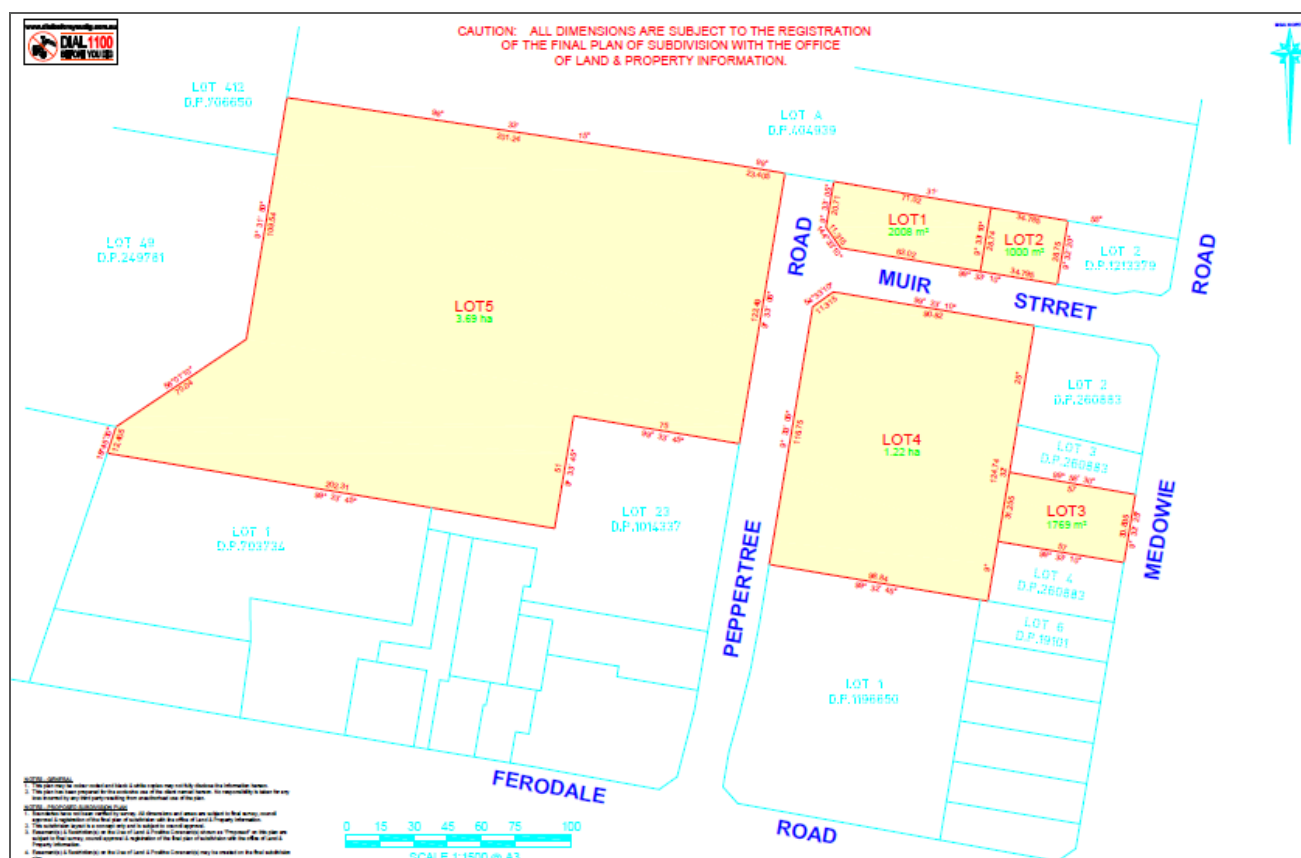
Approved subdivision Plan at 795 Medowie Road as per Approved DA 16-2018-789-1.
